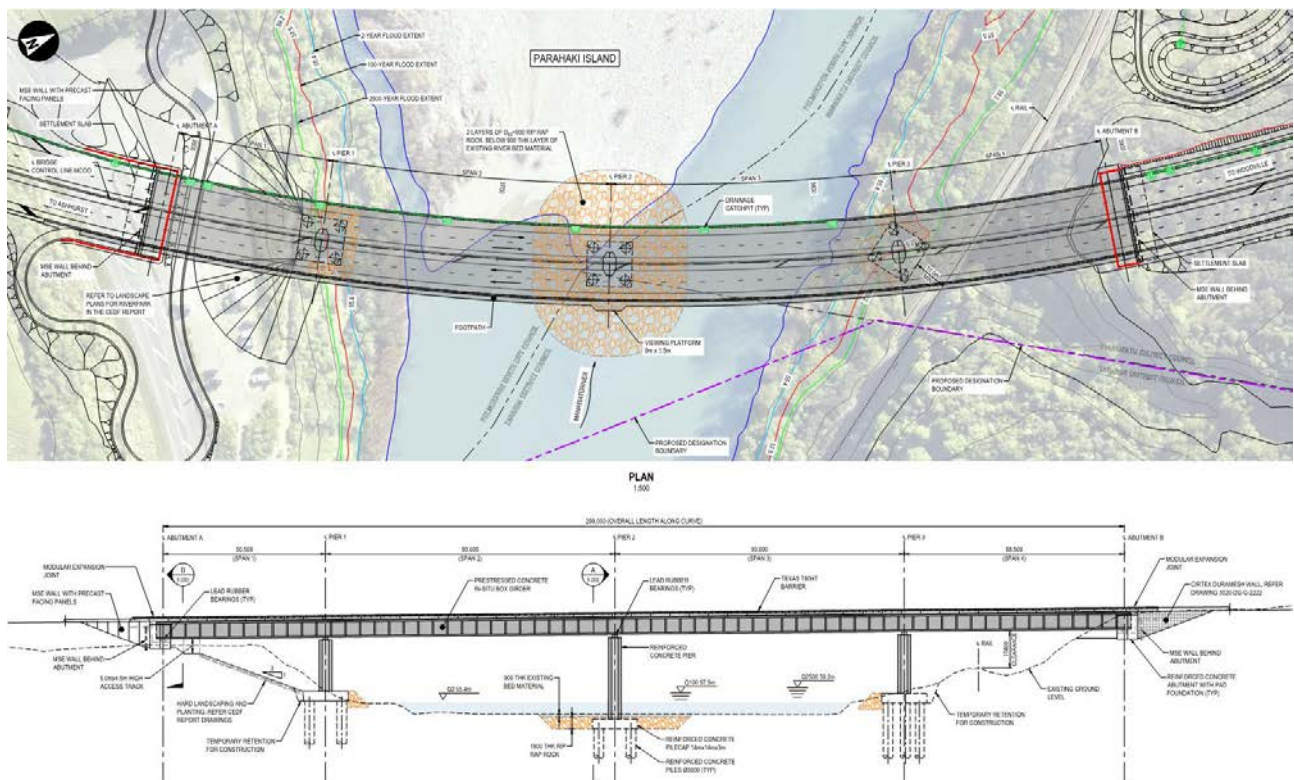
Plan and elevation of proposed bridge (Advance, 2019).
